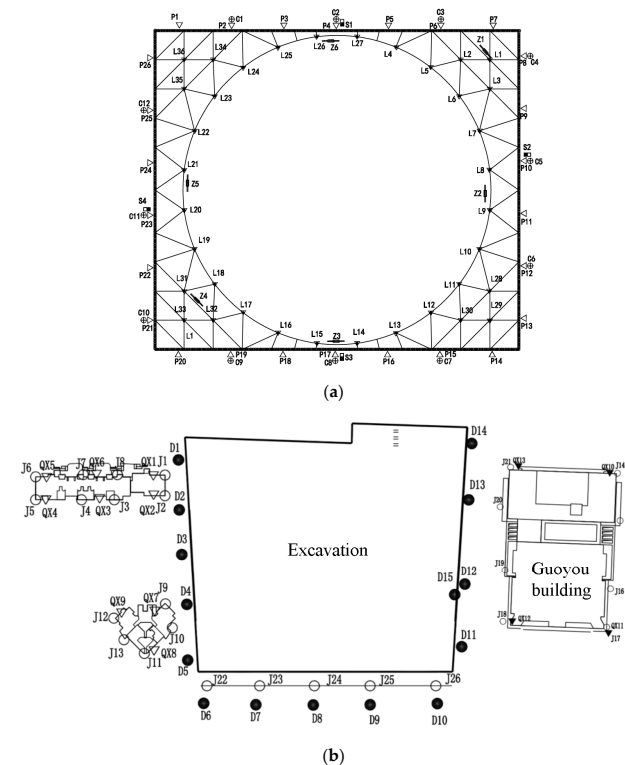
Layout plan of monitoring points: (a) Layout plan for excavation monitoring points. (b) Layout plan for monitoring points of surrounding structures.
